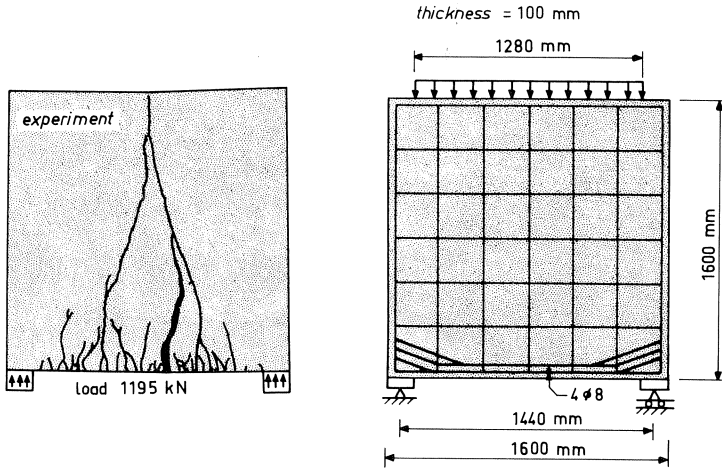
Crack pattern and reinforcement in plate loaded on top.
